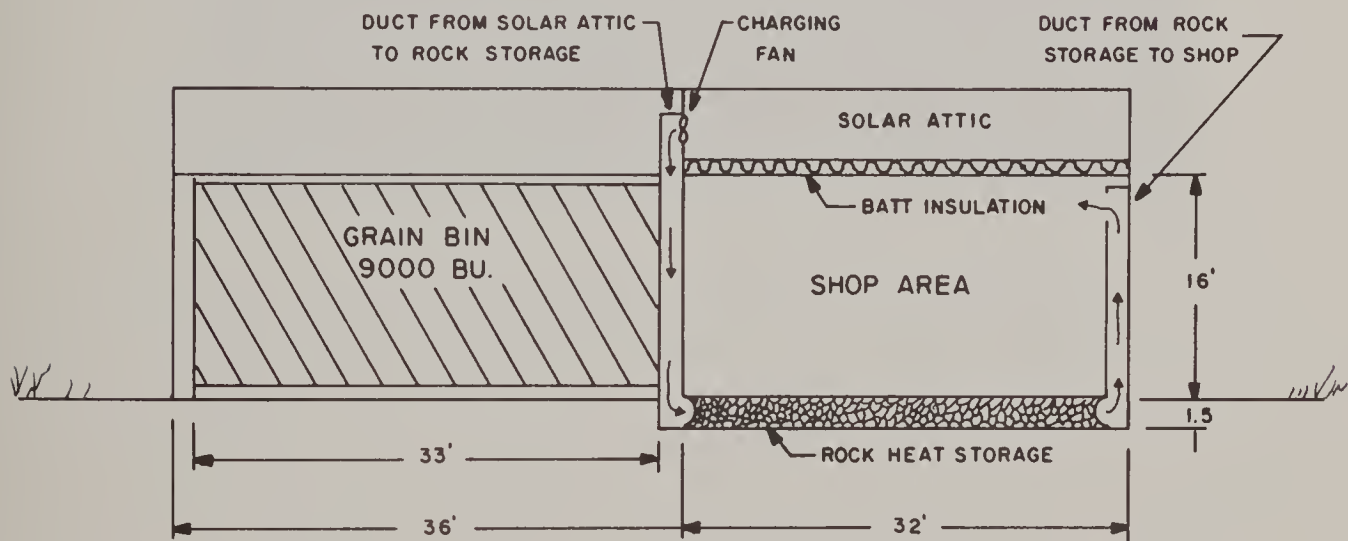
South cross-section view of solar bin-in-building on the Steffen farm.
